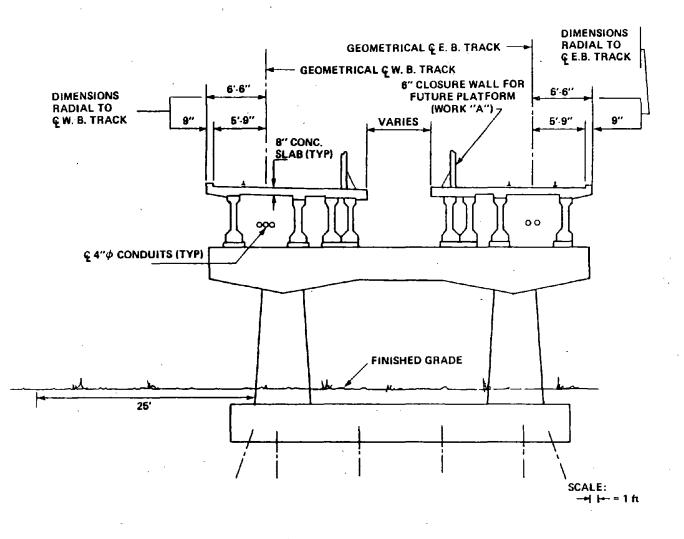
PATCO ELEVATED TRANSIT STRUCTURE CROSS-SECTION AT WESTMONT PIER NO. 5
